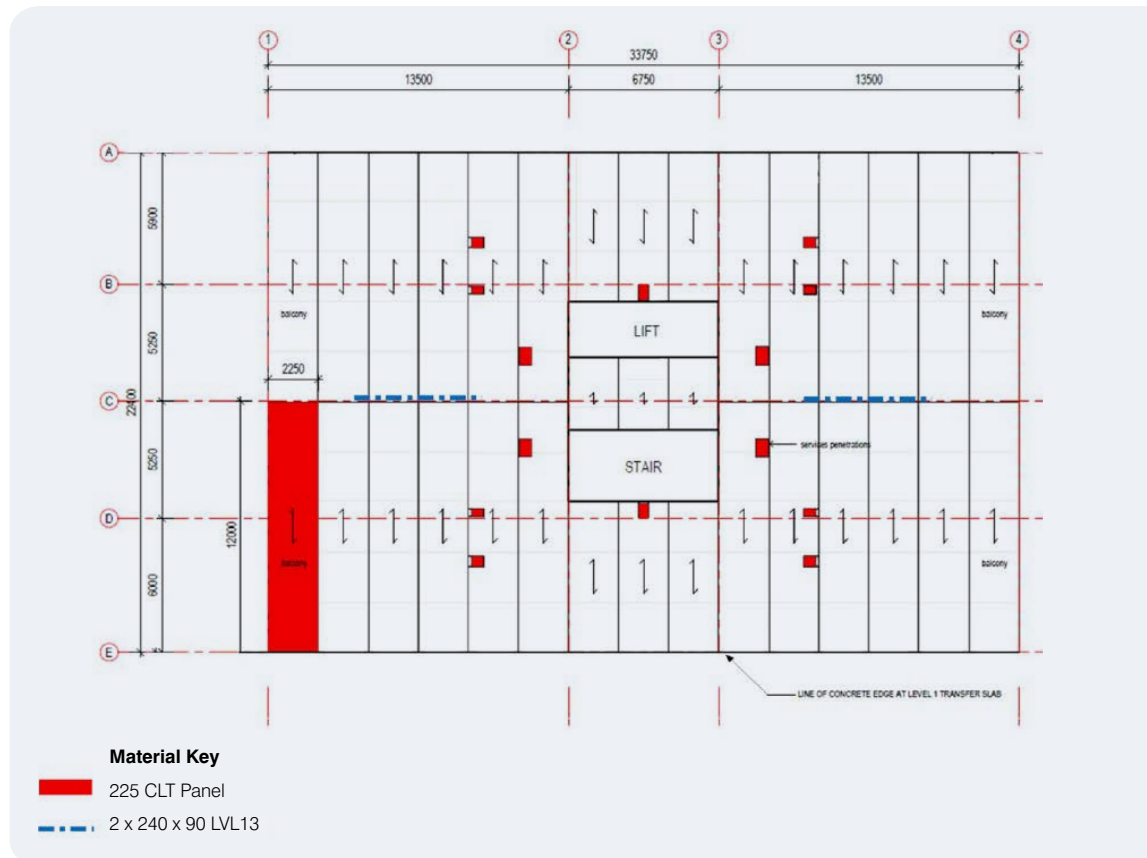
Floor and Roof System Plan Design and image: Studio 505
